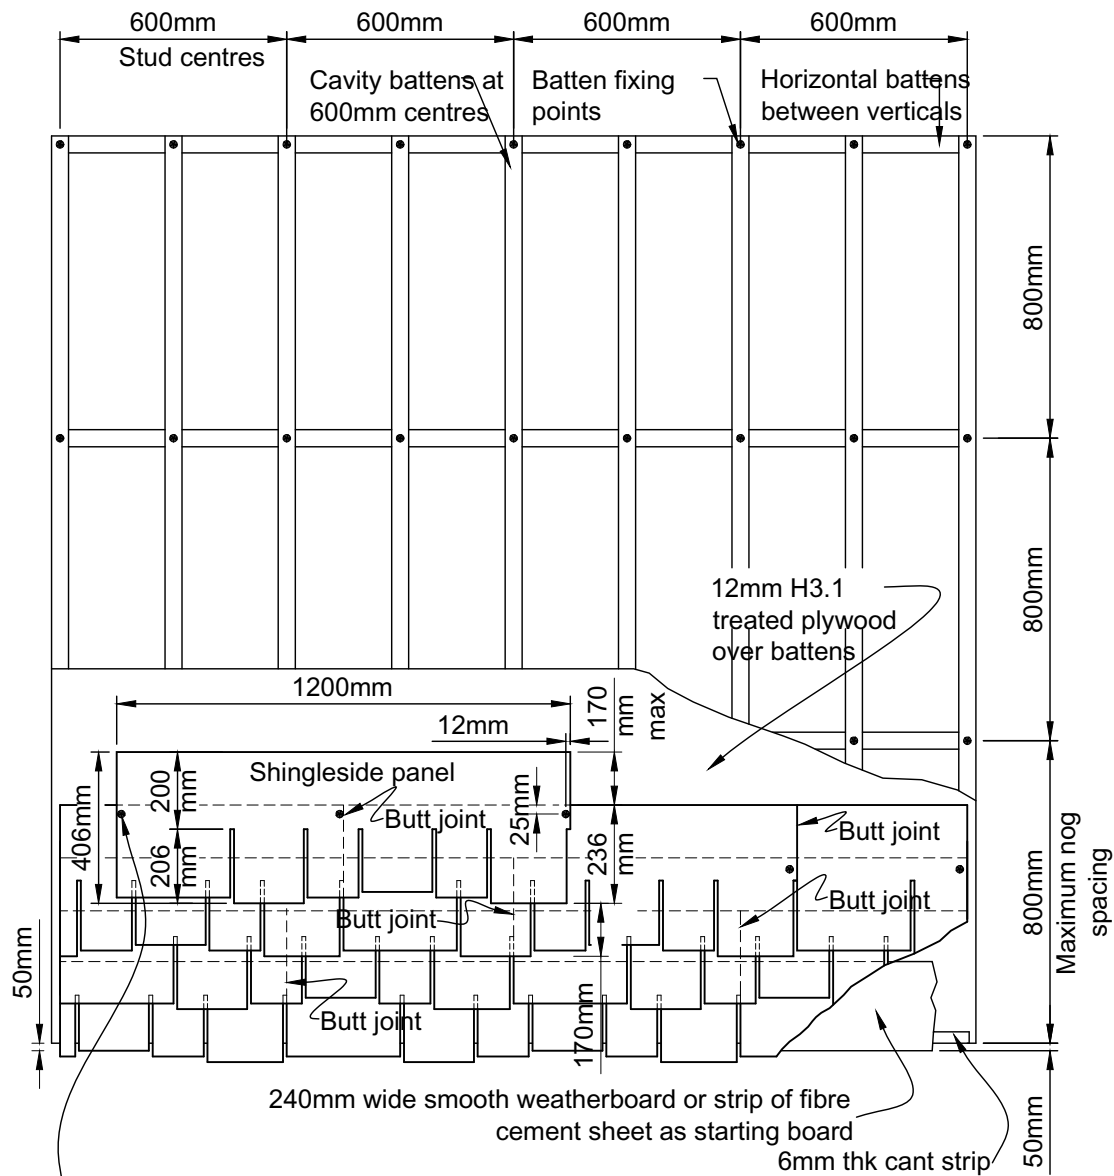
SHINGLESIDE STAGGERED EDGE PANEL LAYOUT
